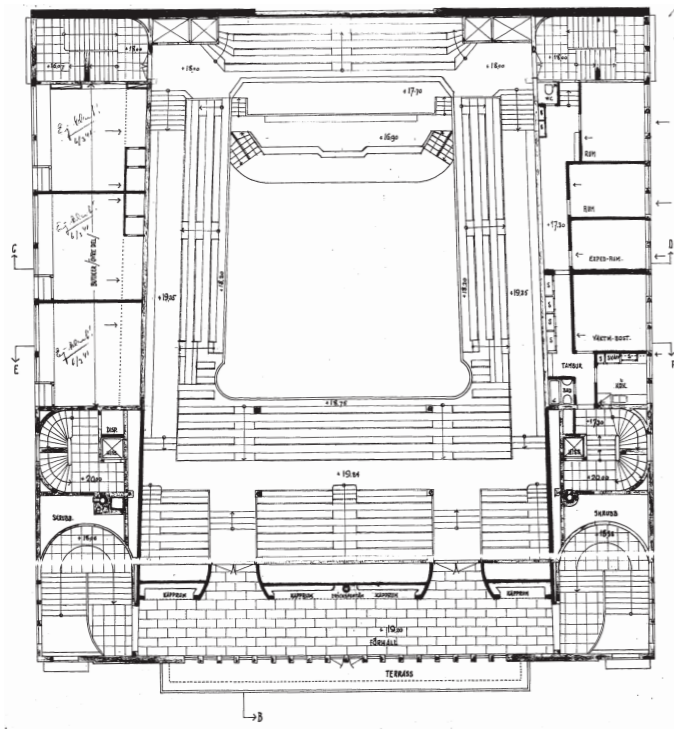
Original drawing (1940) (Göteborgs Stad., n.d.)
